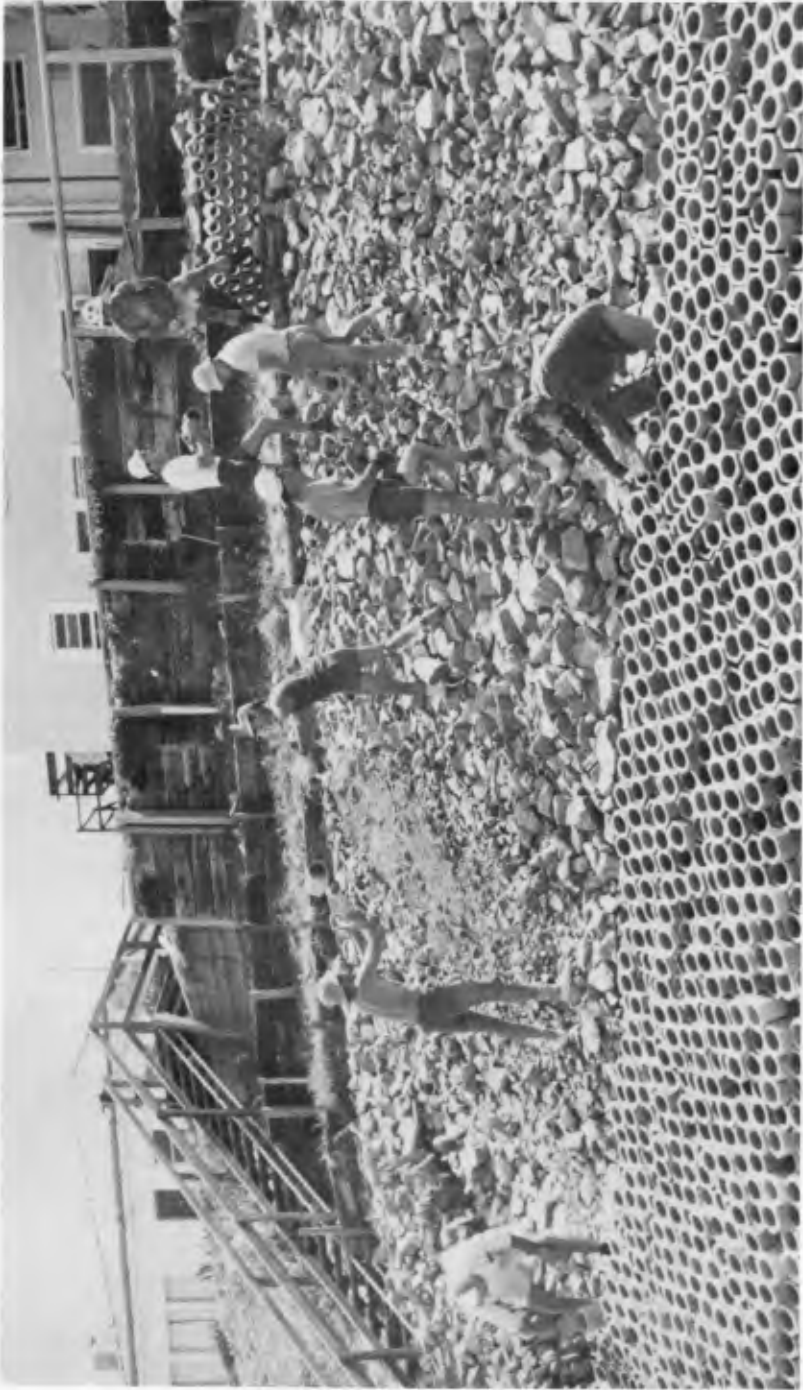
CONSTRUCTION AT WAMBERAL BEACH NSW FEB. 78
